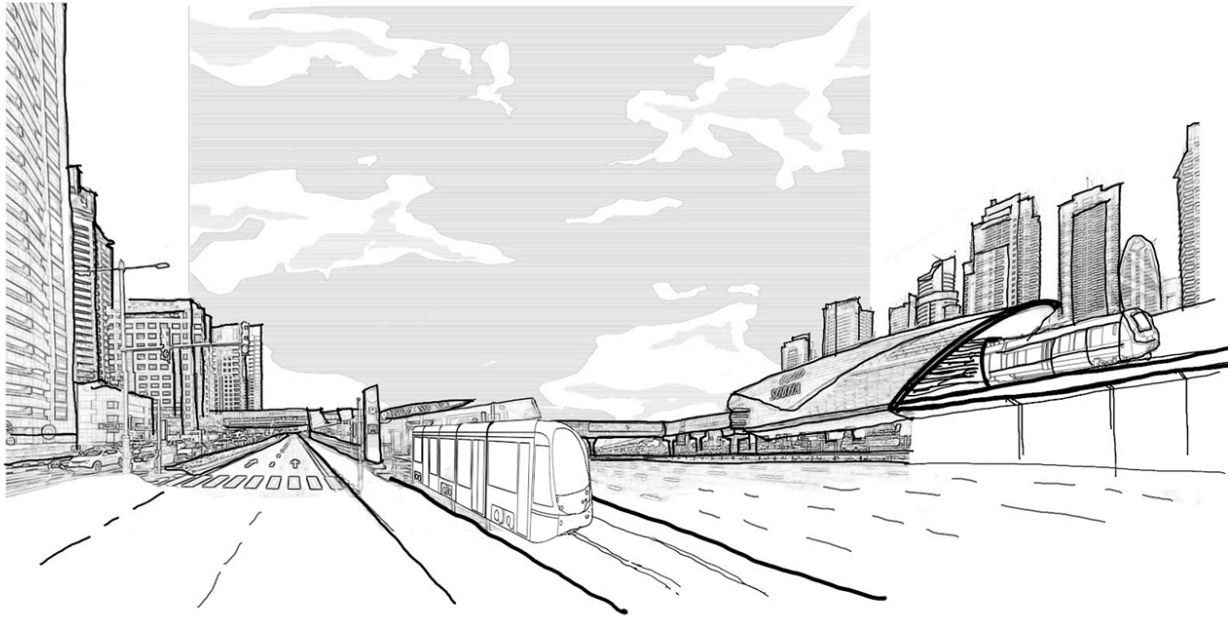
Sectional Sketch of Sobha Realty Metro Station (Source: Author)
